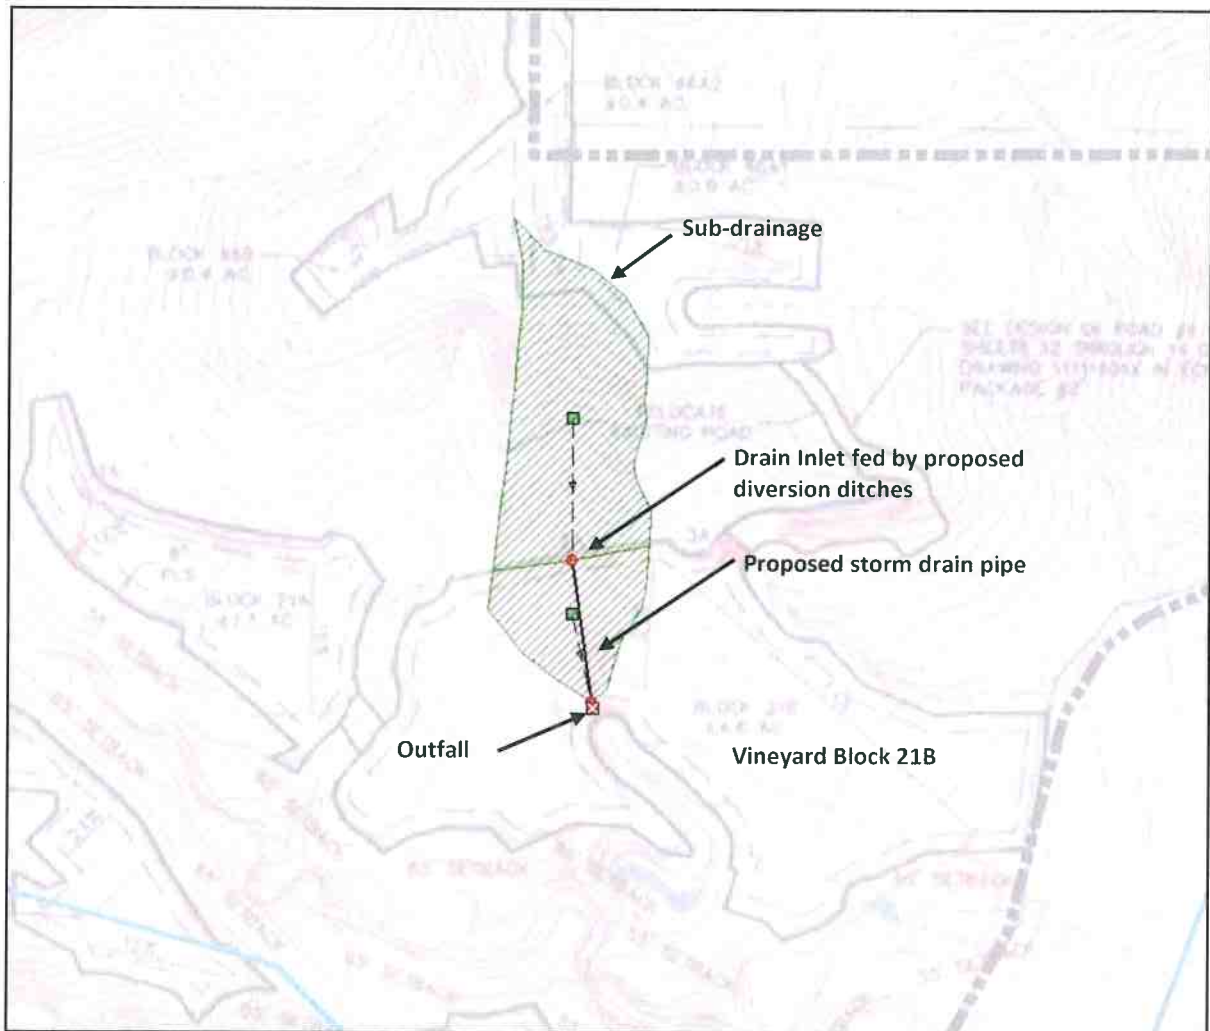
Hydrologic model configuration for proposed conditions (no drainage and with drainage improvements) drainage outfall from Vineyard Block 21B.
